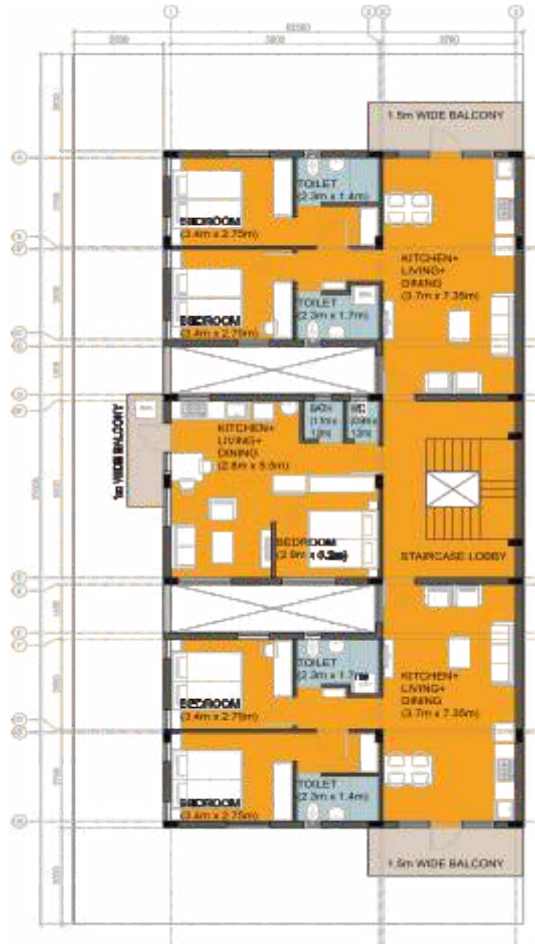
Typical ground floor plan of Type 9 dwelling unit
